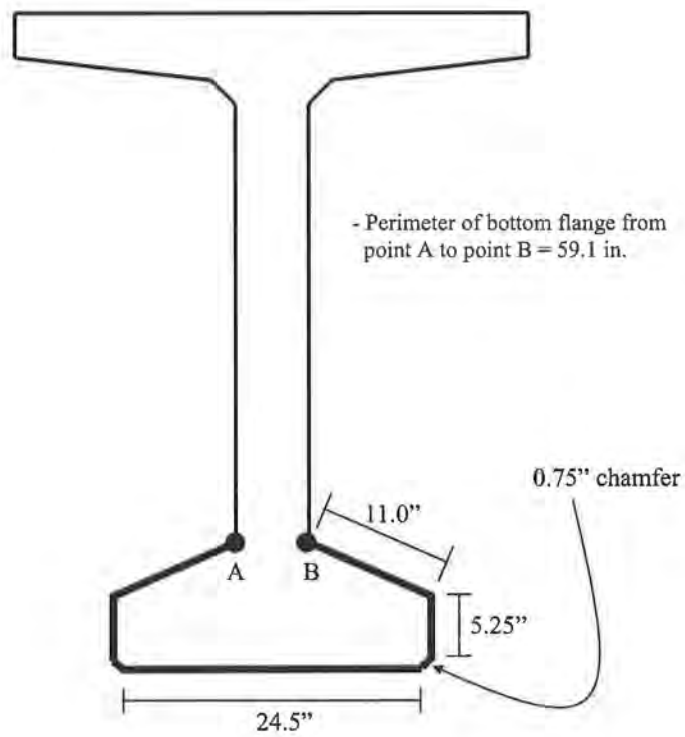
Detail of Bottom Flange of BT54 Girder
